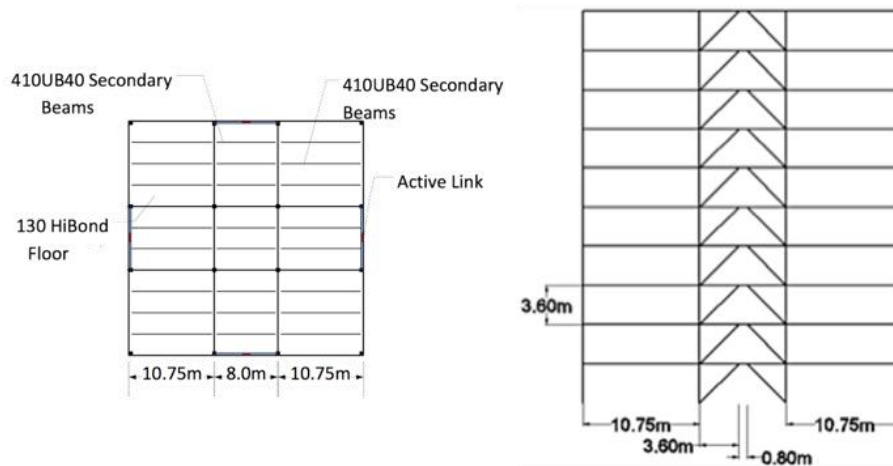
Floor plan and elevation of hypothetical 10-Storey EBF building
